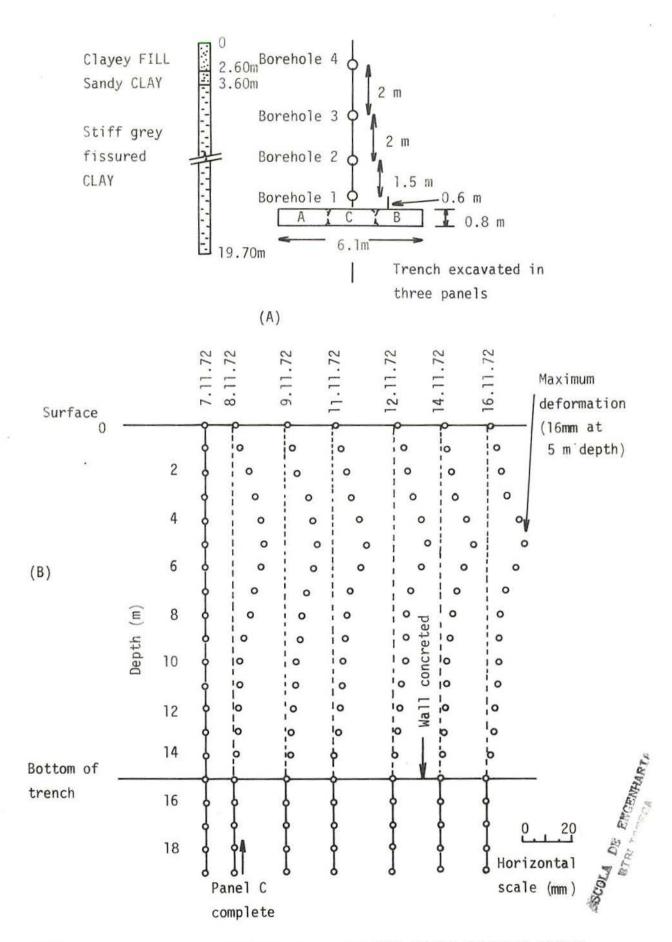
FIELD TEST CARRIED OUT TO MONITOR GROUND MOVEMENT CAUSED BY A BENTONITE SUPPORTED EXCAVATION IN LONDON CLAY, BY FARMER AND ATTEWELL, 1973.(A)Experimental layout, (B)Horizontal deformation at borehole 1.
